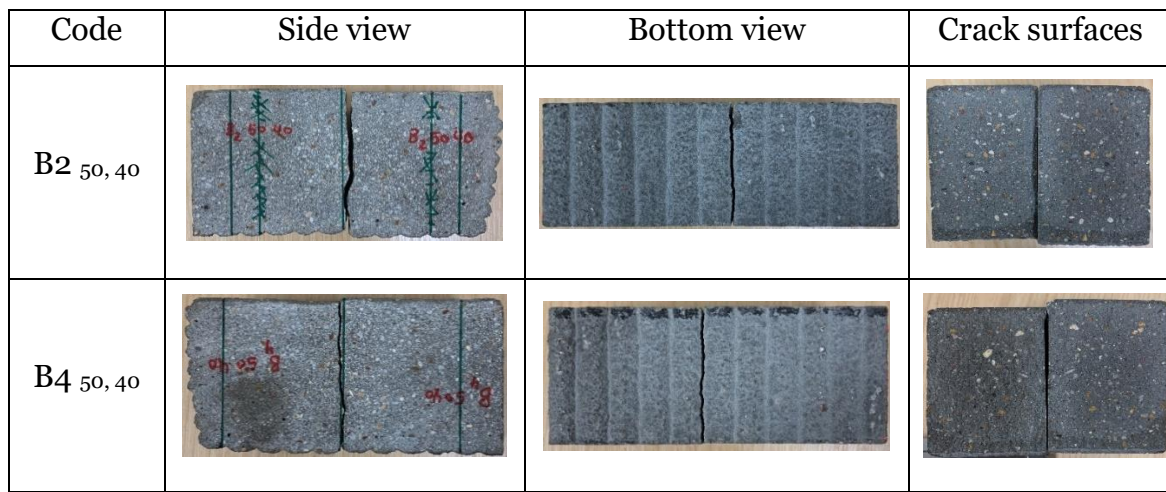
Example photos of side and bottom views of cracking behaviour and crack faces resulted from testing 3D-printed concrete of rough finishing.
